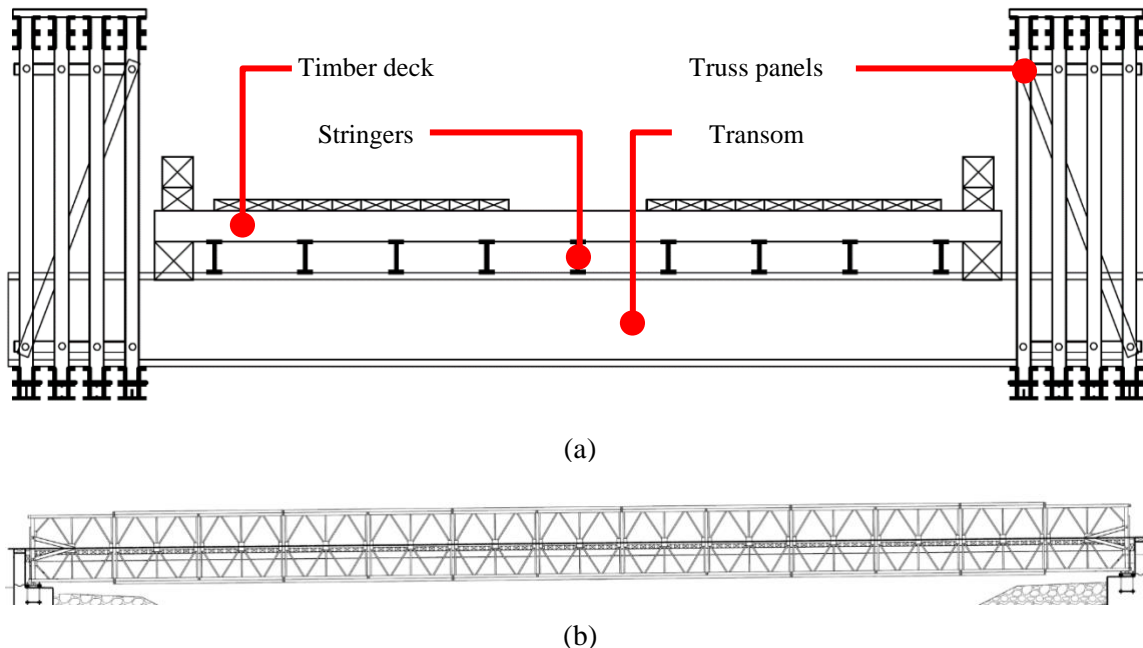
Battle Bridge structural components showing (a) cross-section and (b) south elevation (after [59])
